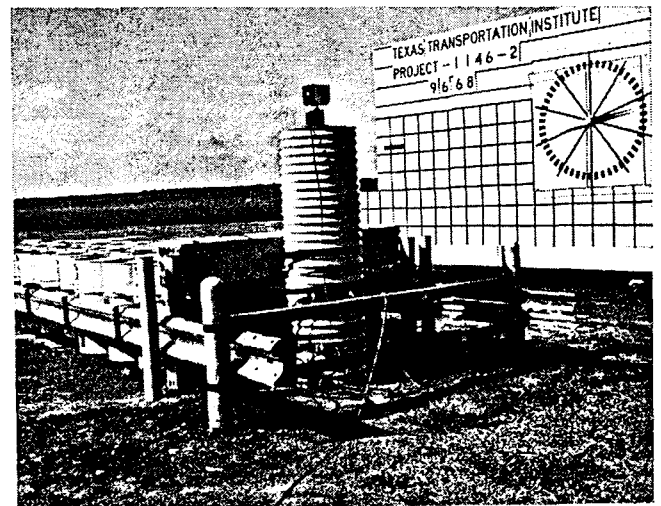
Rear view of modular crash cushion before test, W-section Guardrail is free to slip through supports as barrels deform (1145-2).
